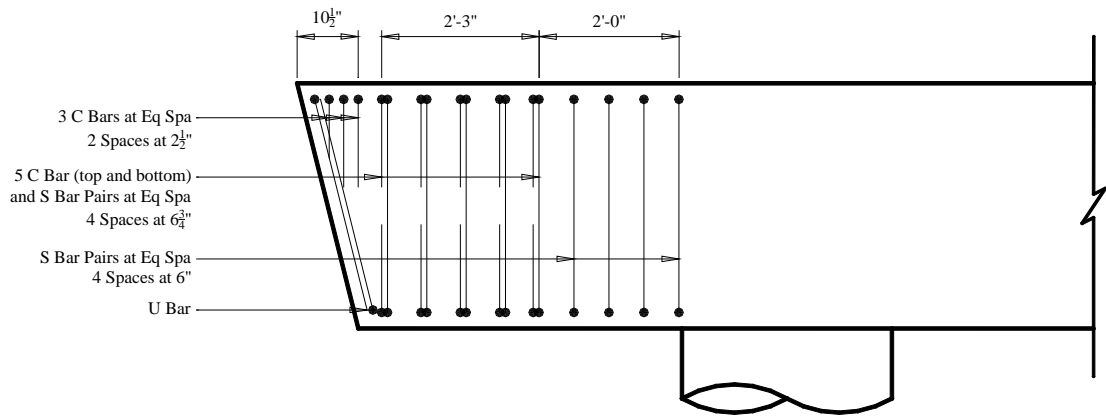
summarizes the end region detailing of the prestressed bent caps. For Phase 1, this consisted of one U-bar placed parallel to battered end face, two C-Bars for the spalling and shear reinforcement up to  $D/4$  with four pairs of S-Bars and C-Bars for bursting forces and shear reinforcement up to the transfer length of the prestressing steel (Figure 4.11[a]). The square end of the bent caps only exists for the experimental testing of the bent cap specimens. The end region detailing of the square ends was the same as the battered ends, except modified to account for the non-sloped face.
